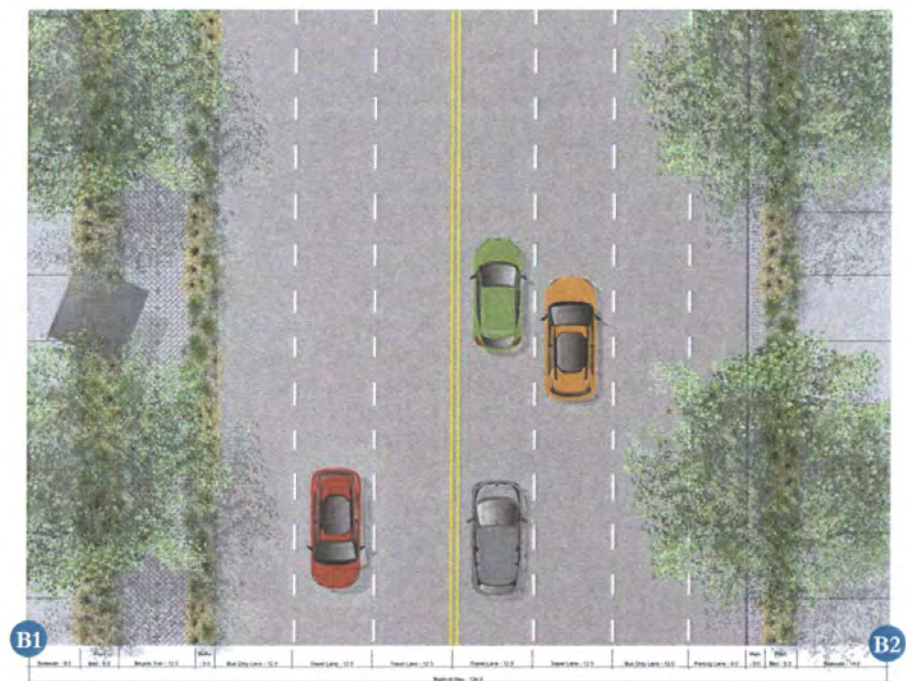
Superior Avenue between East 12th and 13th Zoomed-In Plan
